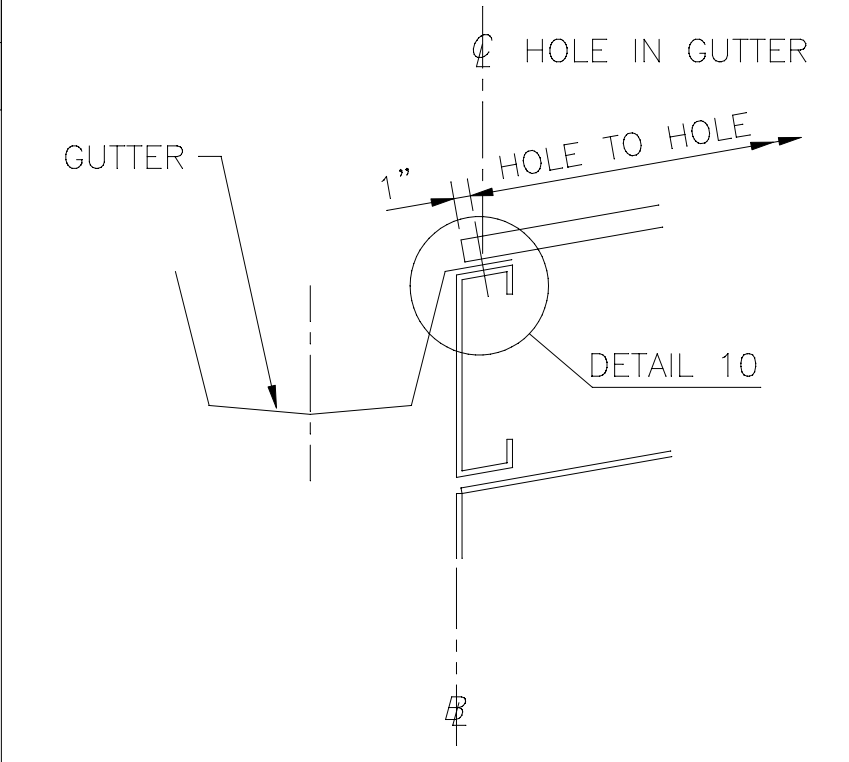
RECESSED GUTTER PARAPET CONDITION
